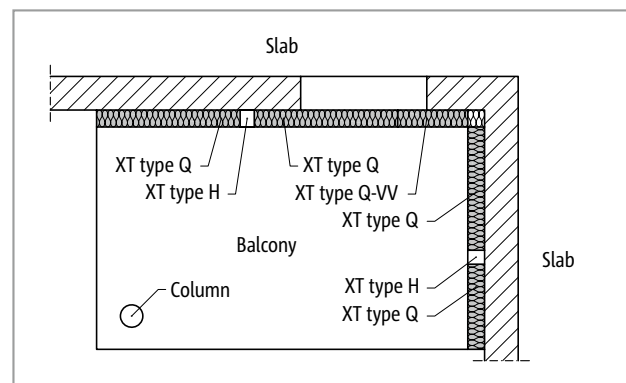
Schöck Isokorb® XT type H: Balcony supported on two sides using columns
